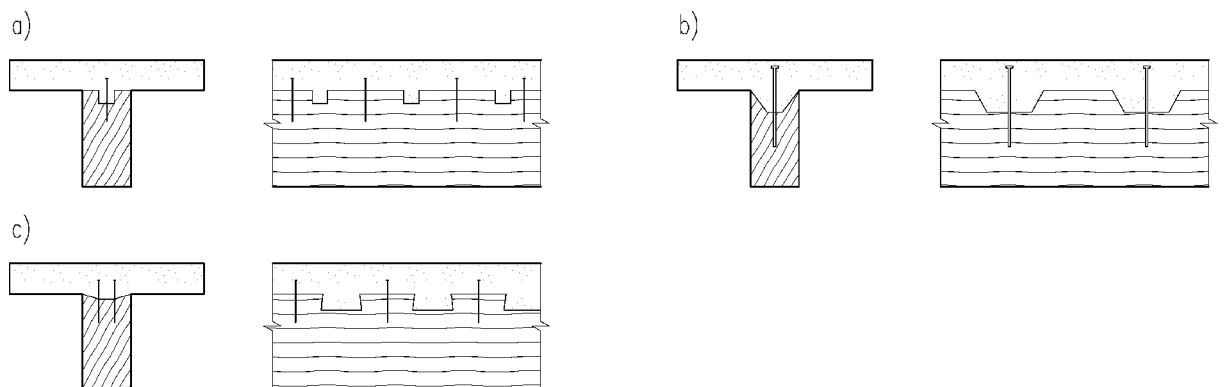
Shear key/anchor connections: a)round notches in timber with fasteners preventing uplift, b)cup notches and prestressed steel bars, c)square notches with fasteners preventing uplift
